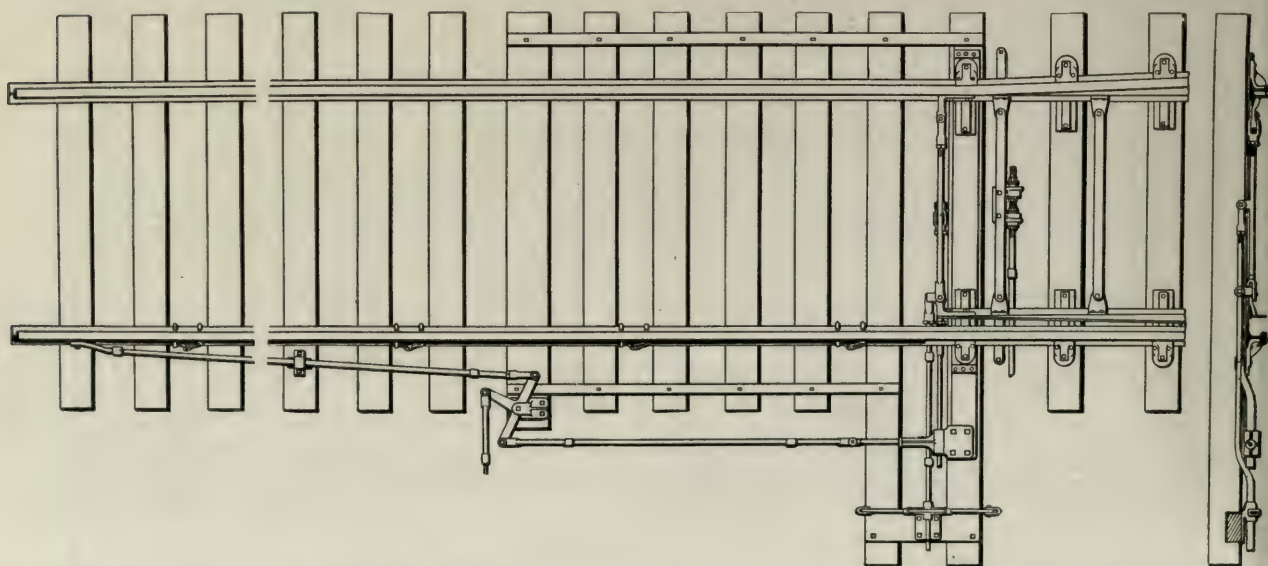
Outside Connected Facing Point Lock and Switch Fittings, with Bolt Lock. Detector Bar Ahead of the Points.
